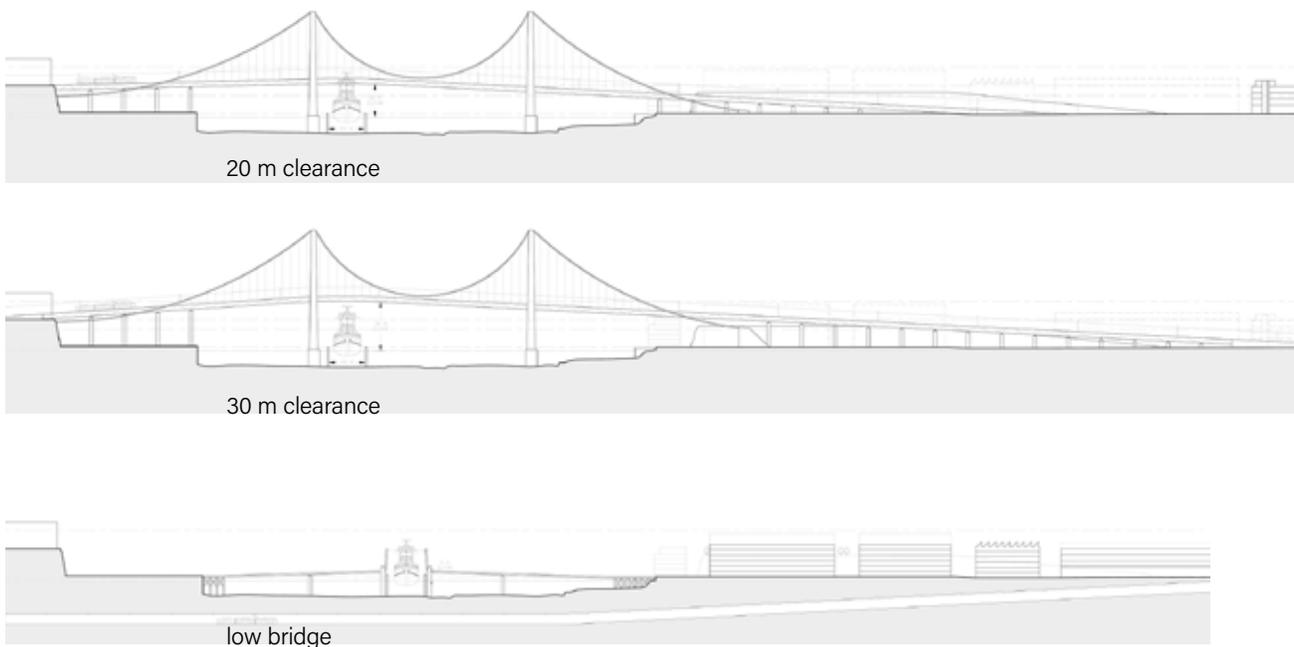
These sections indicating new bridge configurations suggest that a new high bridge connecting to South Lindholmen could further divide Old Lindholmen from Central Lindholmen, and requires a long inland distance to slope back
